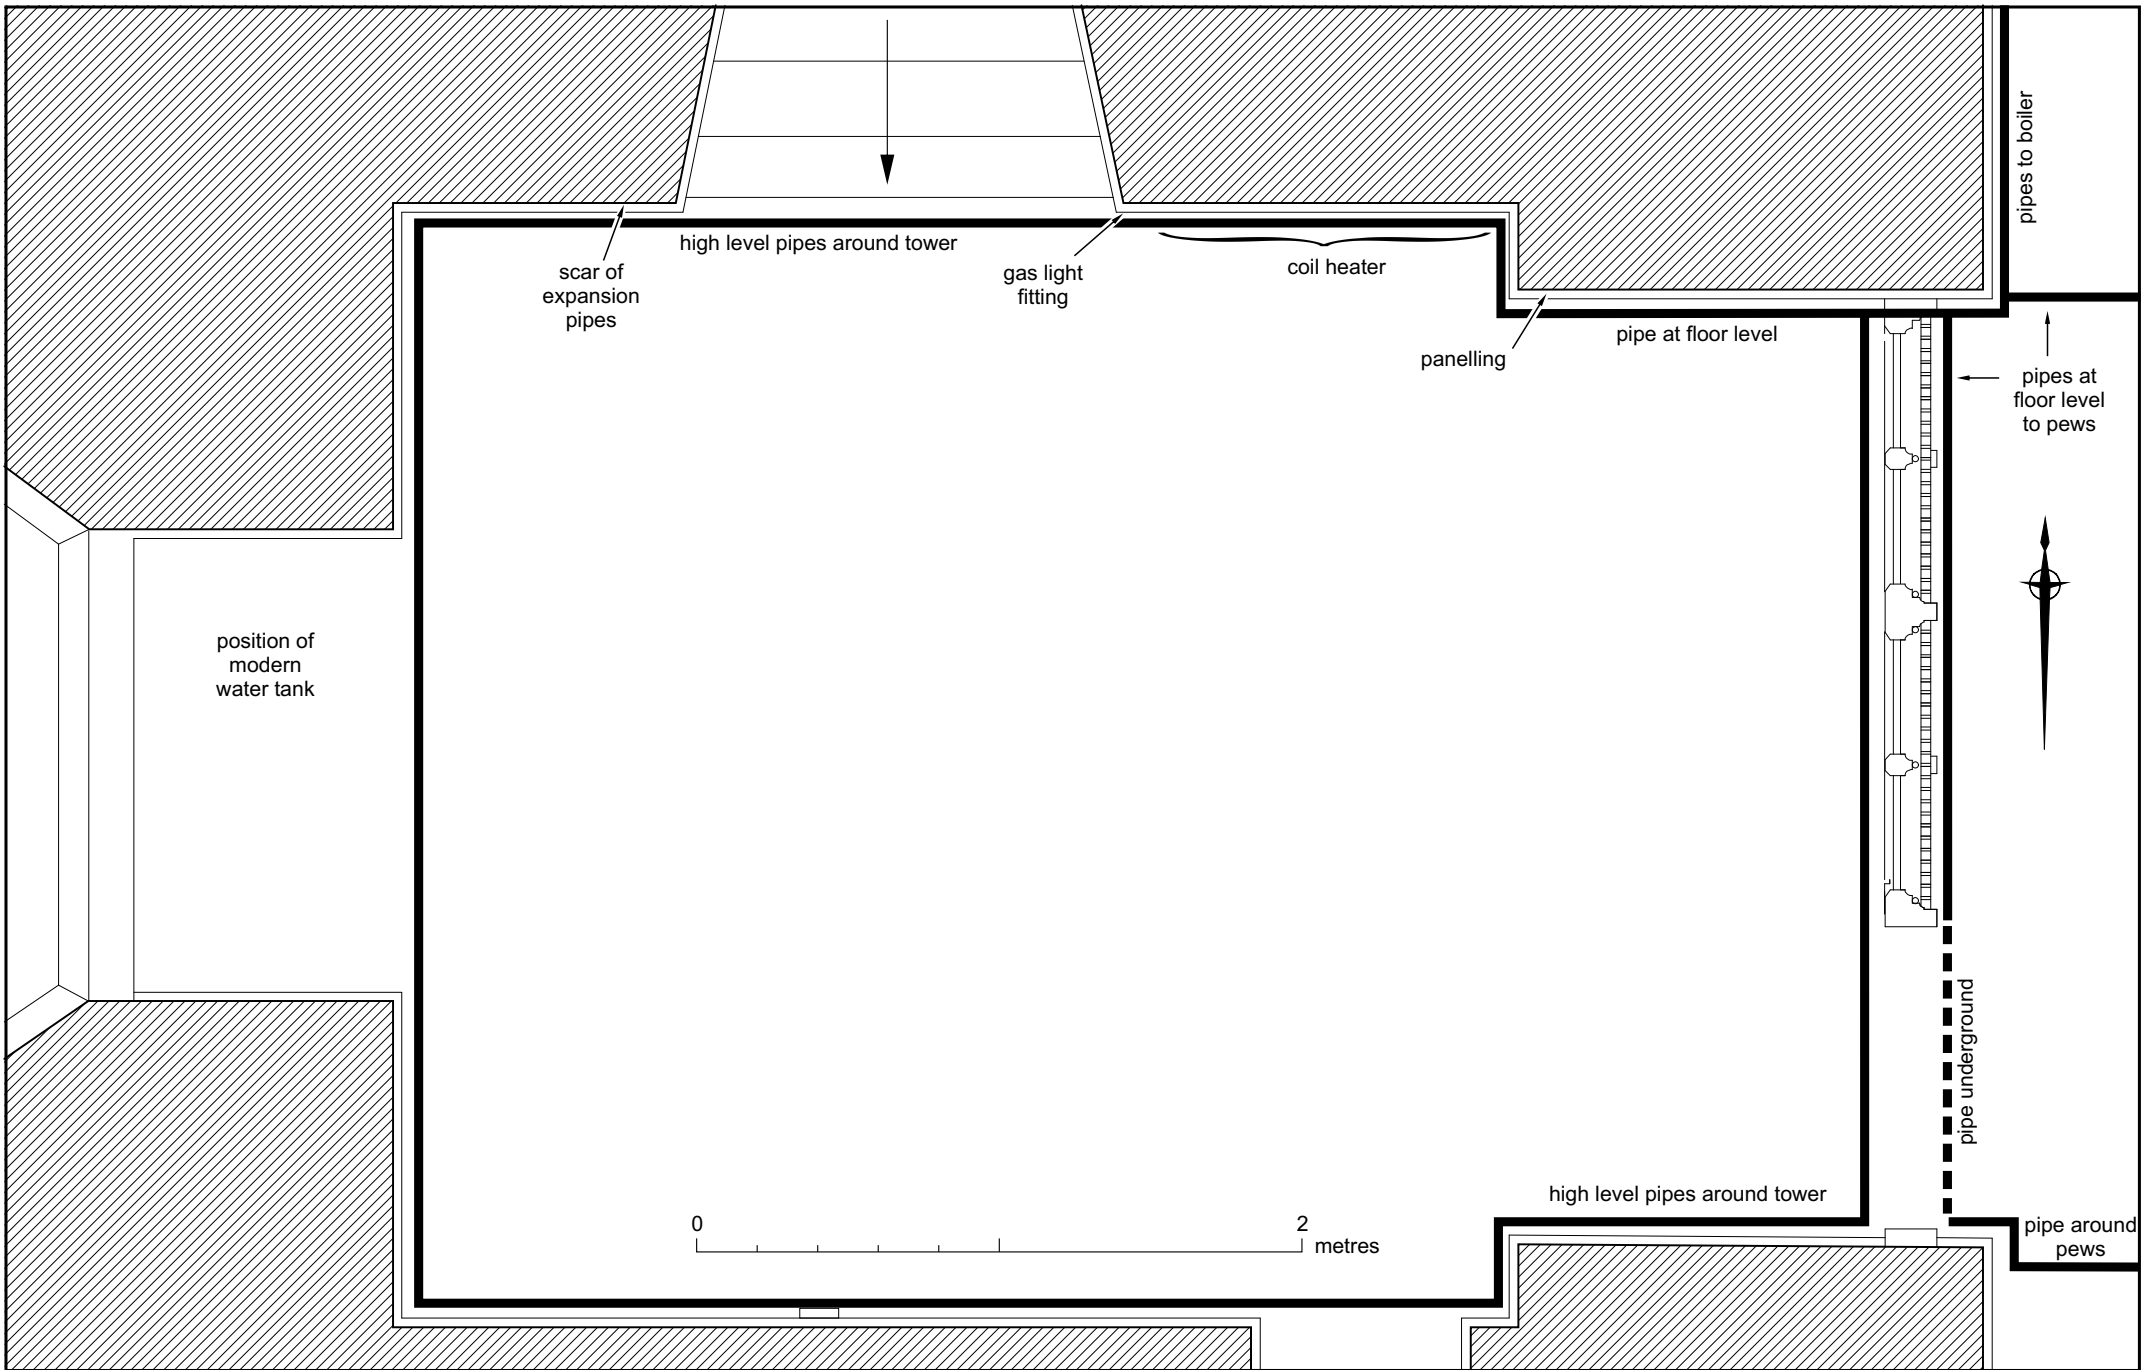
Plan of the tower showing location of heating pipes (based on a plan of the arrangement as proposed, supplied by Jonathan Rhind Architects).
